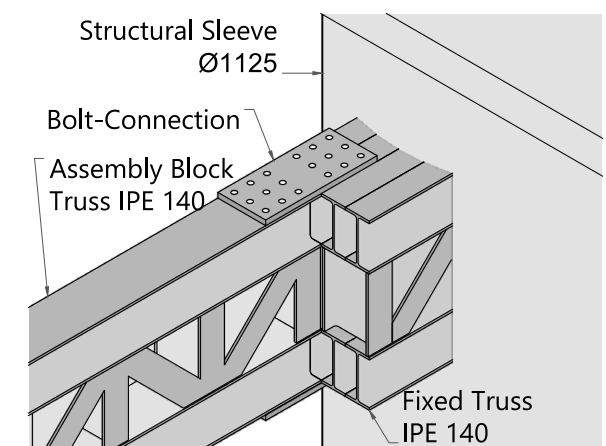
DETAIL STEPS TO ATTACH ASSEMBLY BLOCKS WITH THE REMAINING STRUCTURES
